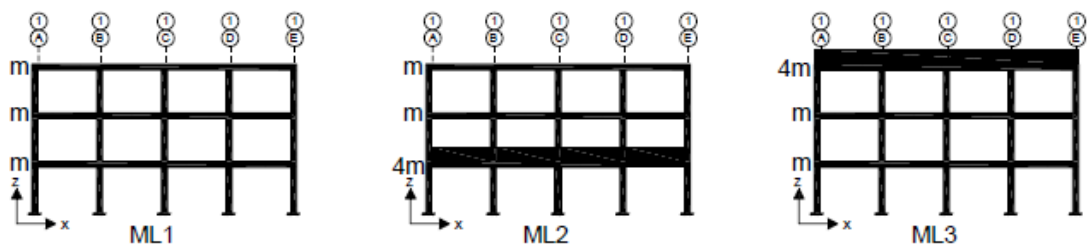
Elevation view of three story RC frame (mass irregularity)
